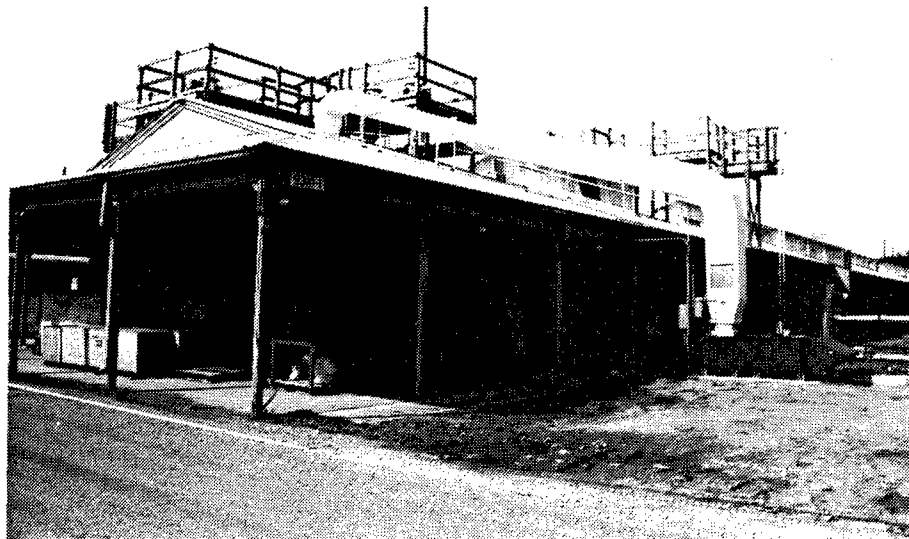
Building 9310-01: Rolled Powder Building of Rolled Powder Area #4 (RP4).
